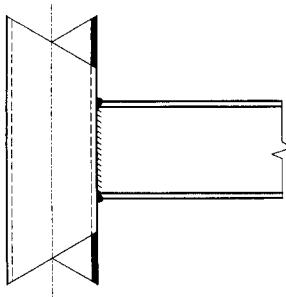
Beam-to-column connection with members directly welded to each other
